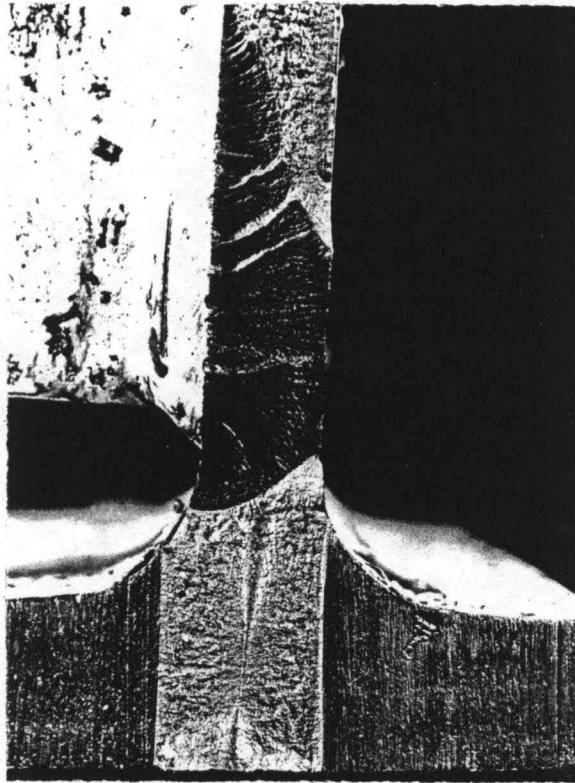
Fatigue Crack Growth at Termination of Stiffener-to-Web Fillet Weld²⁰
